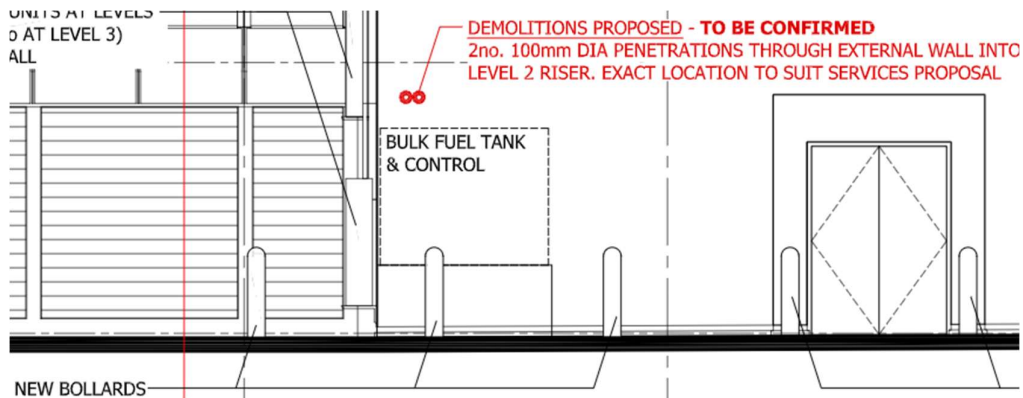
Elevation showing the proposed fuel tank, new bollards and penetrations at Level 2 (Source: Architon LLP)
